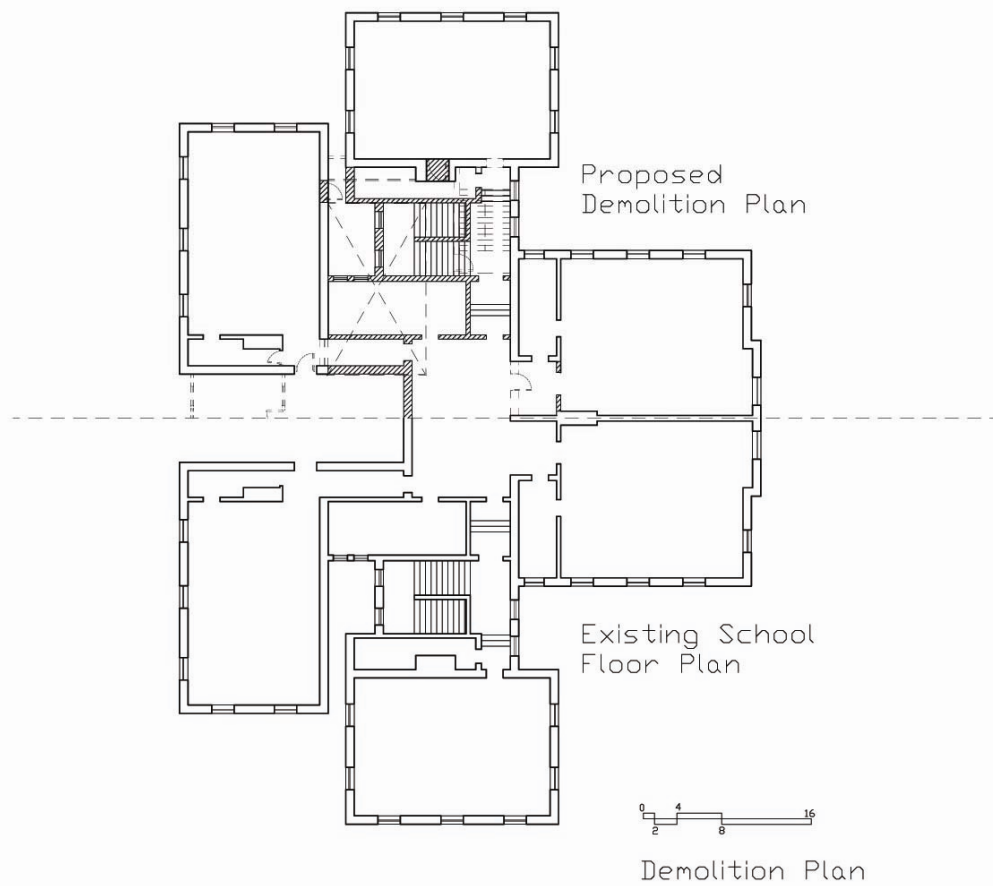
Stevens Elementary School Proposed Demolition Plan
